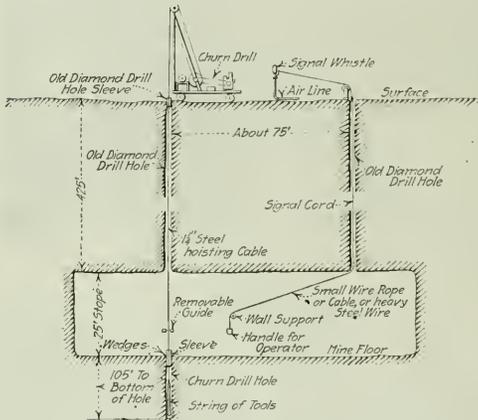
GENERAL ARRANGEMENT OF DRILLING EQUIPMENT
